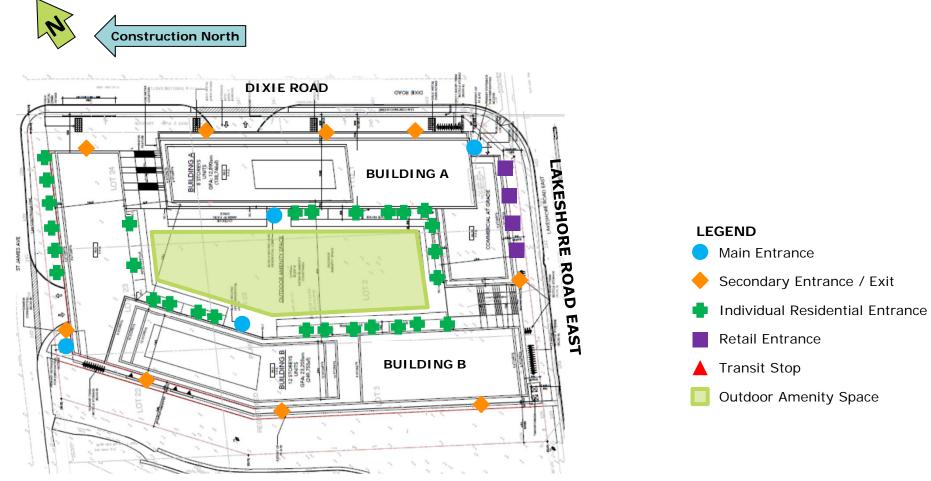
Areas of interest (Site Plan, April 17, 2018)
